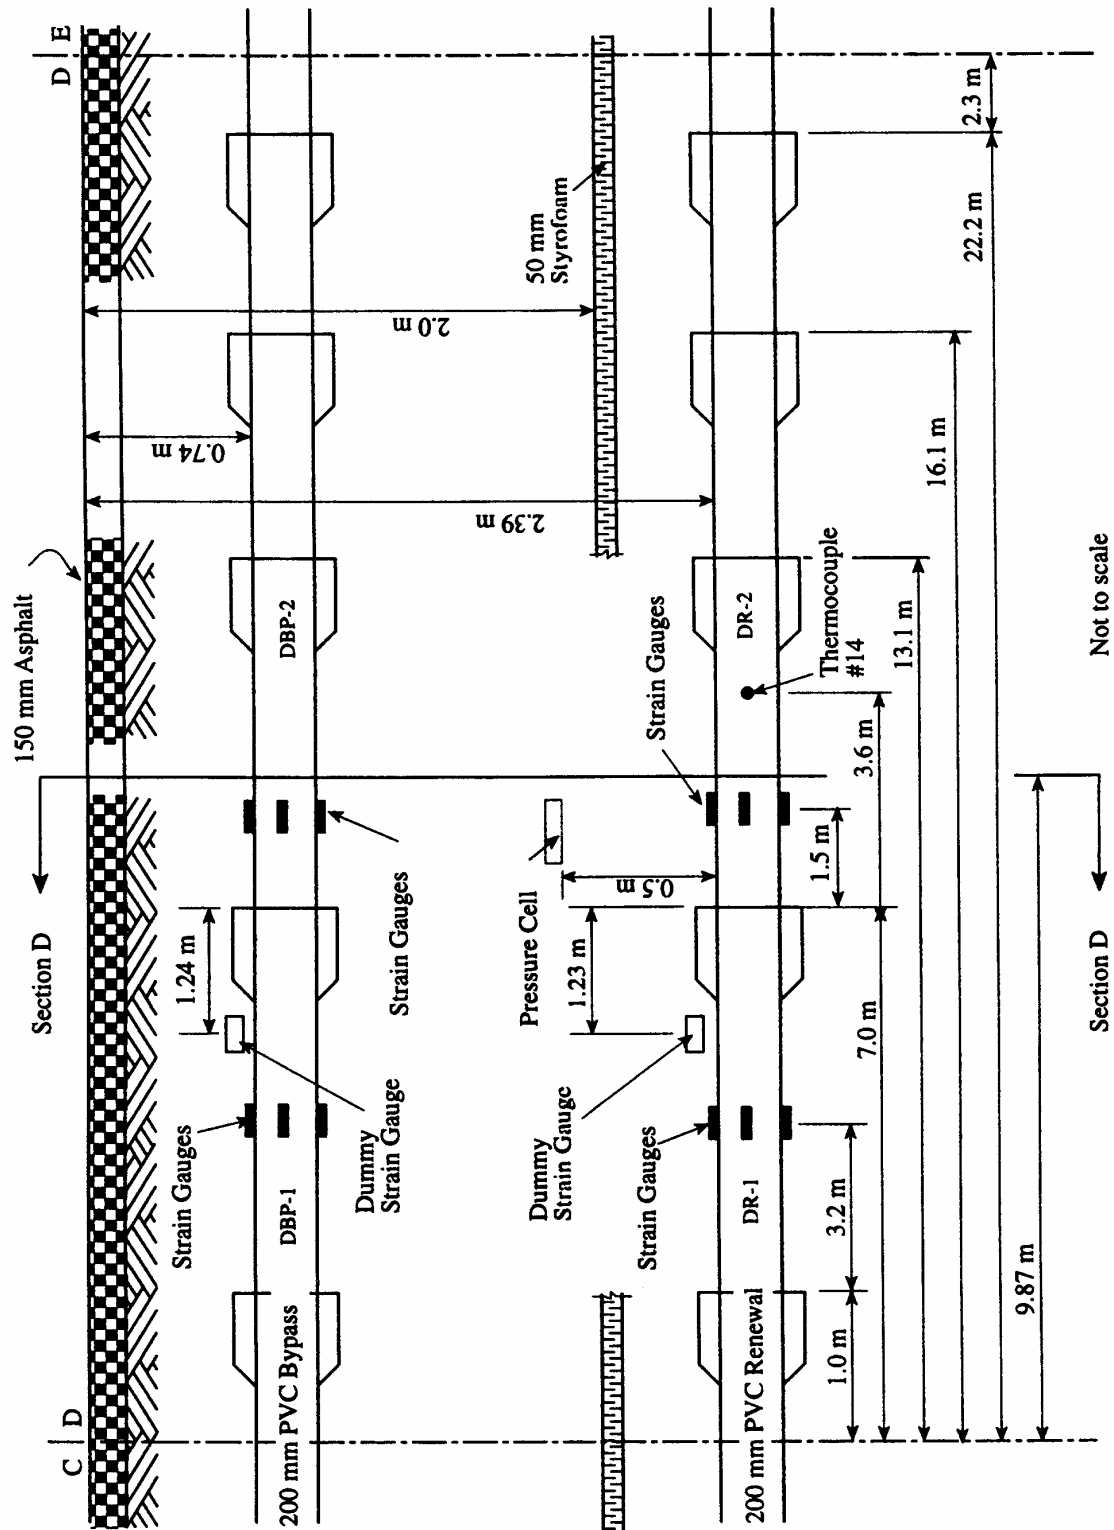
Longitudinal section of bypass and renewal pipes with Fillcrete trench backfill (section D)
